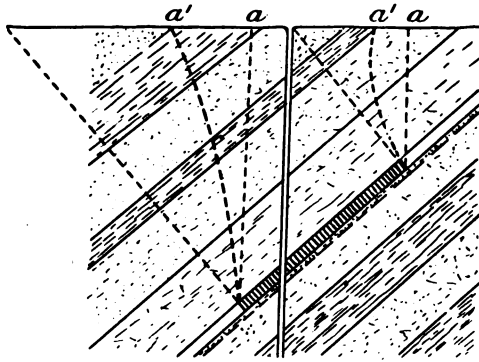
Shaft Pillar in an Inclined Seam and the Lines of Fracture due to Subsidence.
